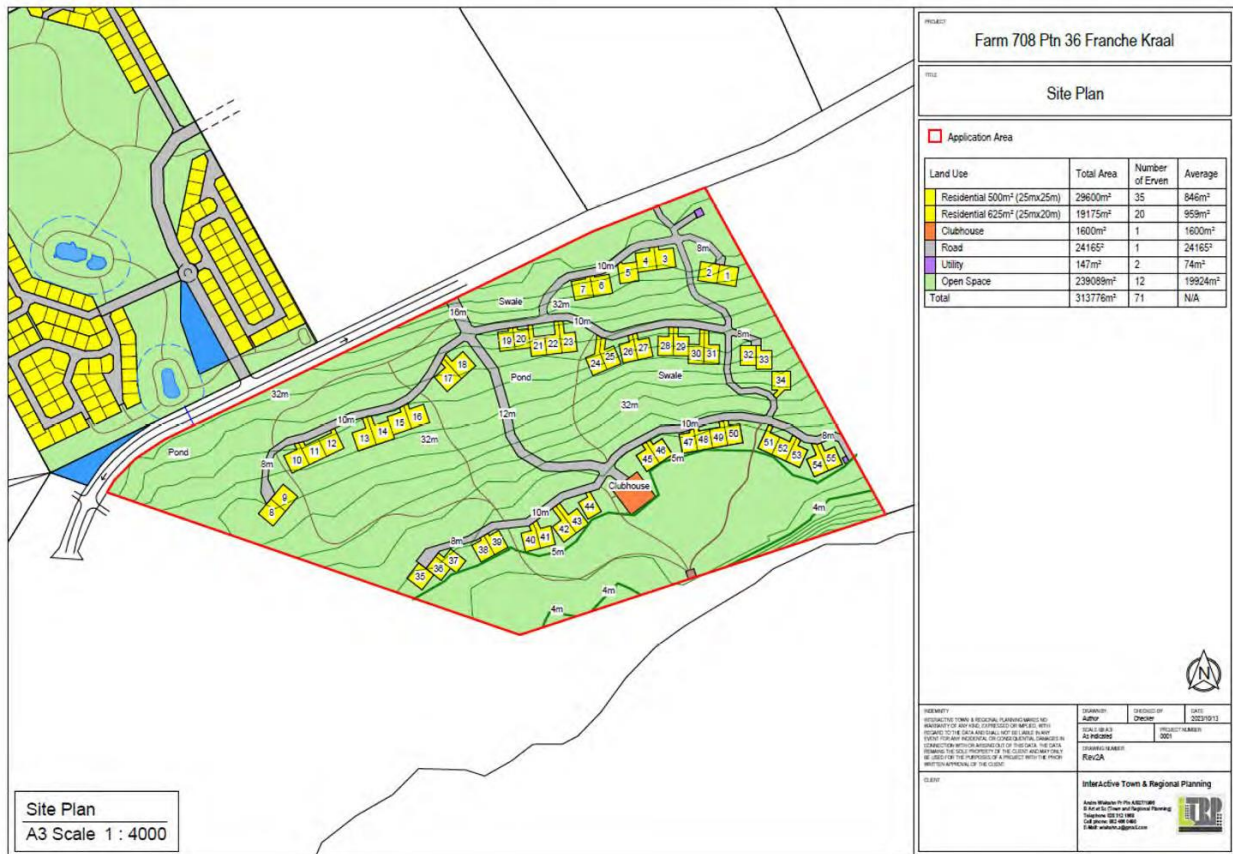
Draft site plan showing proposed lay out of road network, housing units, boat house (source: Lornay Environmental Consulting)
